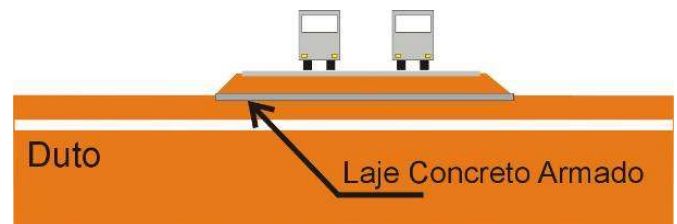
UNFAVORABLE SOILS CONDITIONS AT NEW INTERSECTIONS – CASE 3.
